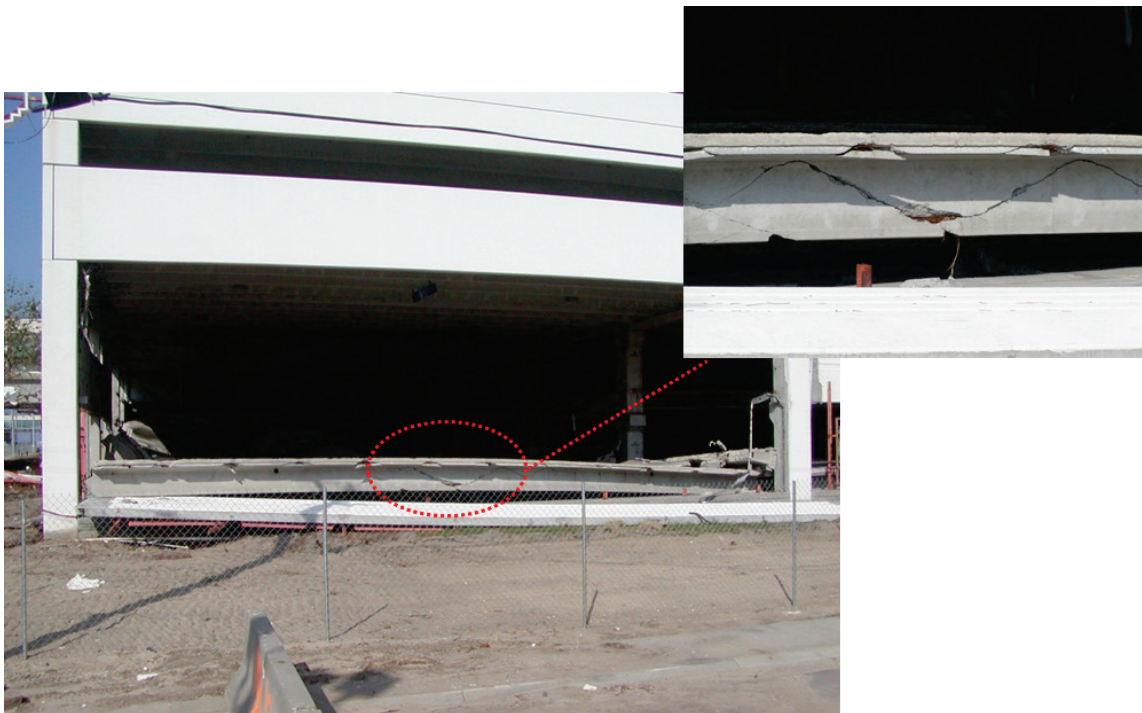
Negative bending failure of a prestressed double-tee floor system due to uplift forces, 2005 Hurricane Katrina (photos courtesy of I. Robertson).
